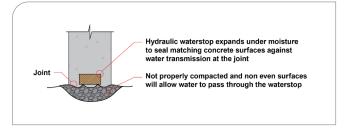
HYDROPHILIC WATERSTOP AT WALL TO SLAB/FOOTING JOINT
